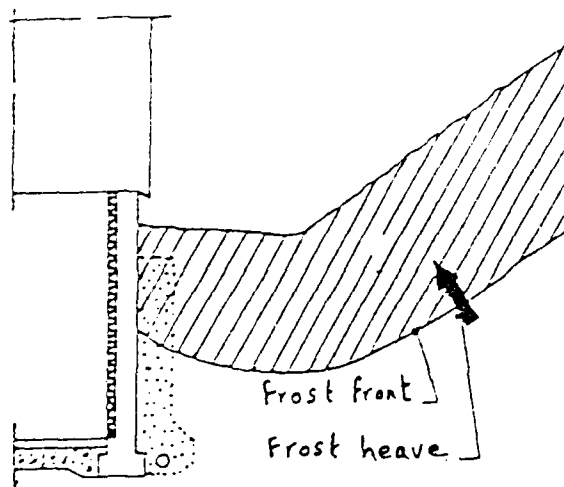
With an inclined soil surface, the frost heave can have a horizontal component towards basement wall
